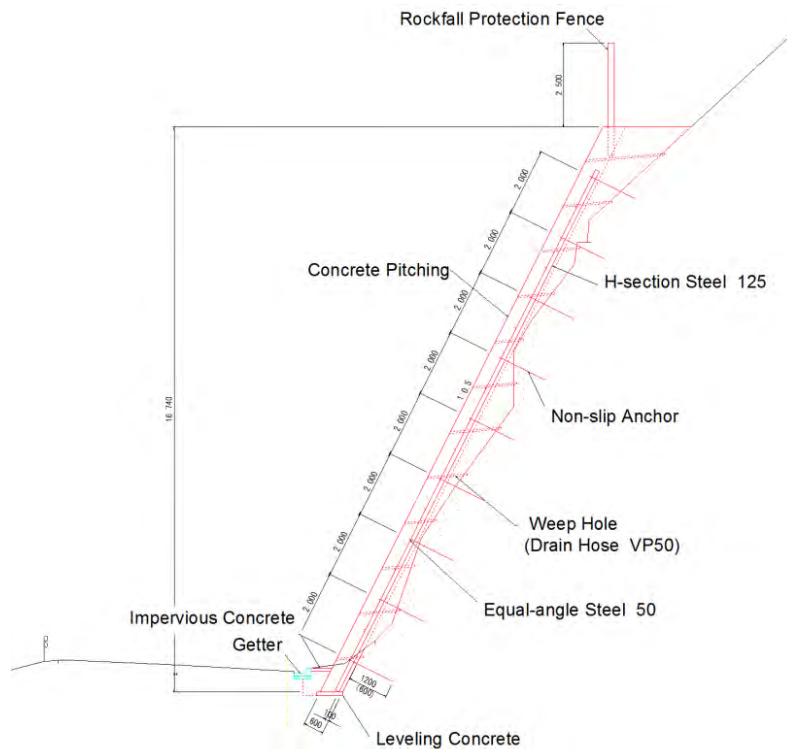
EXAMPLE OF GROUTED RIPRAP (2/2)
